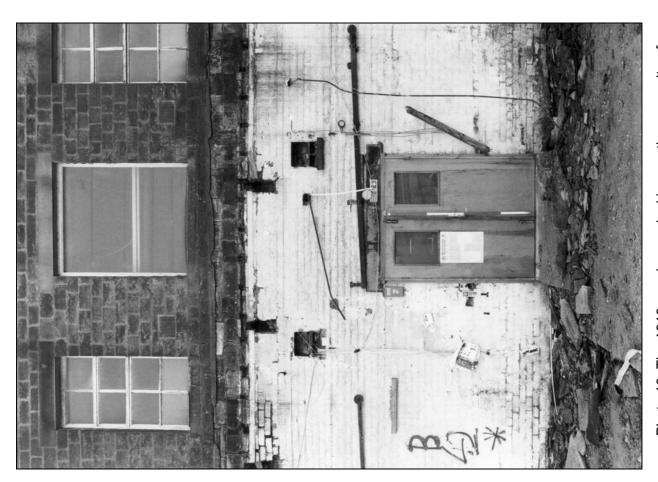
The 1910 warehouse, looking south across site of demolished weaving shed (film 1, frame 8)
